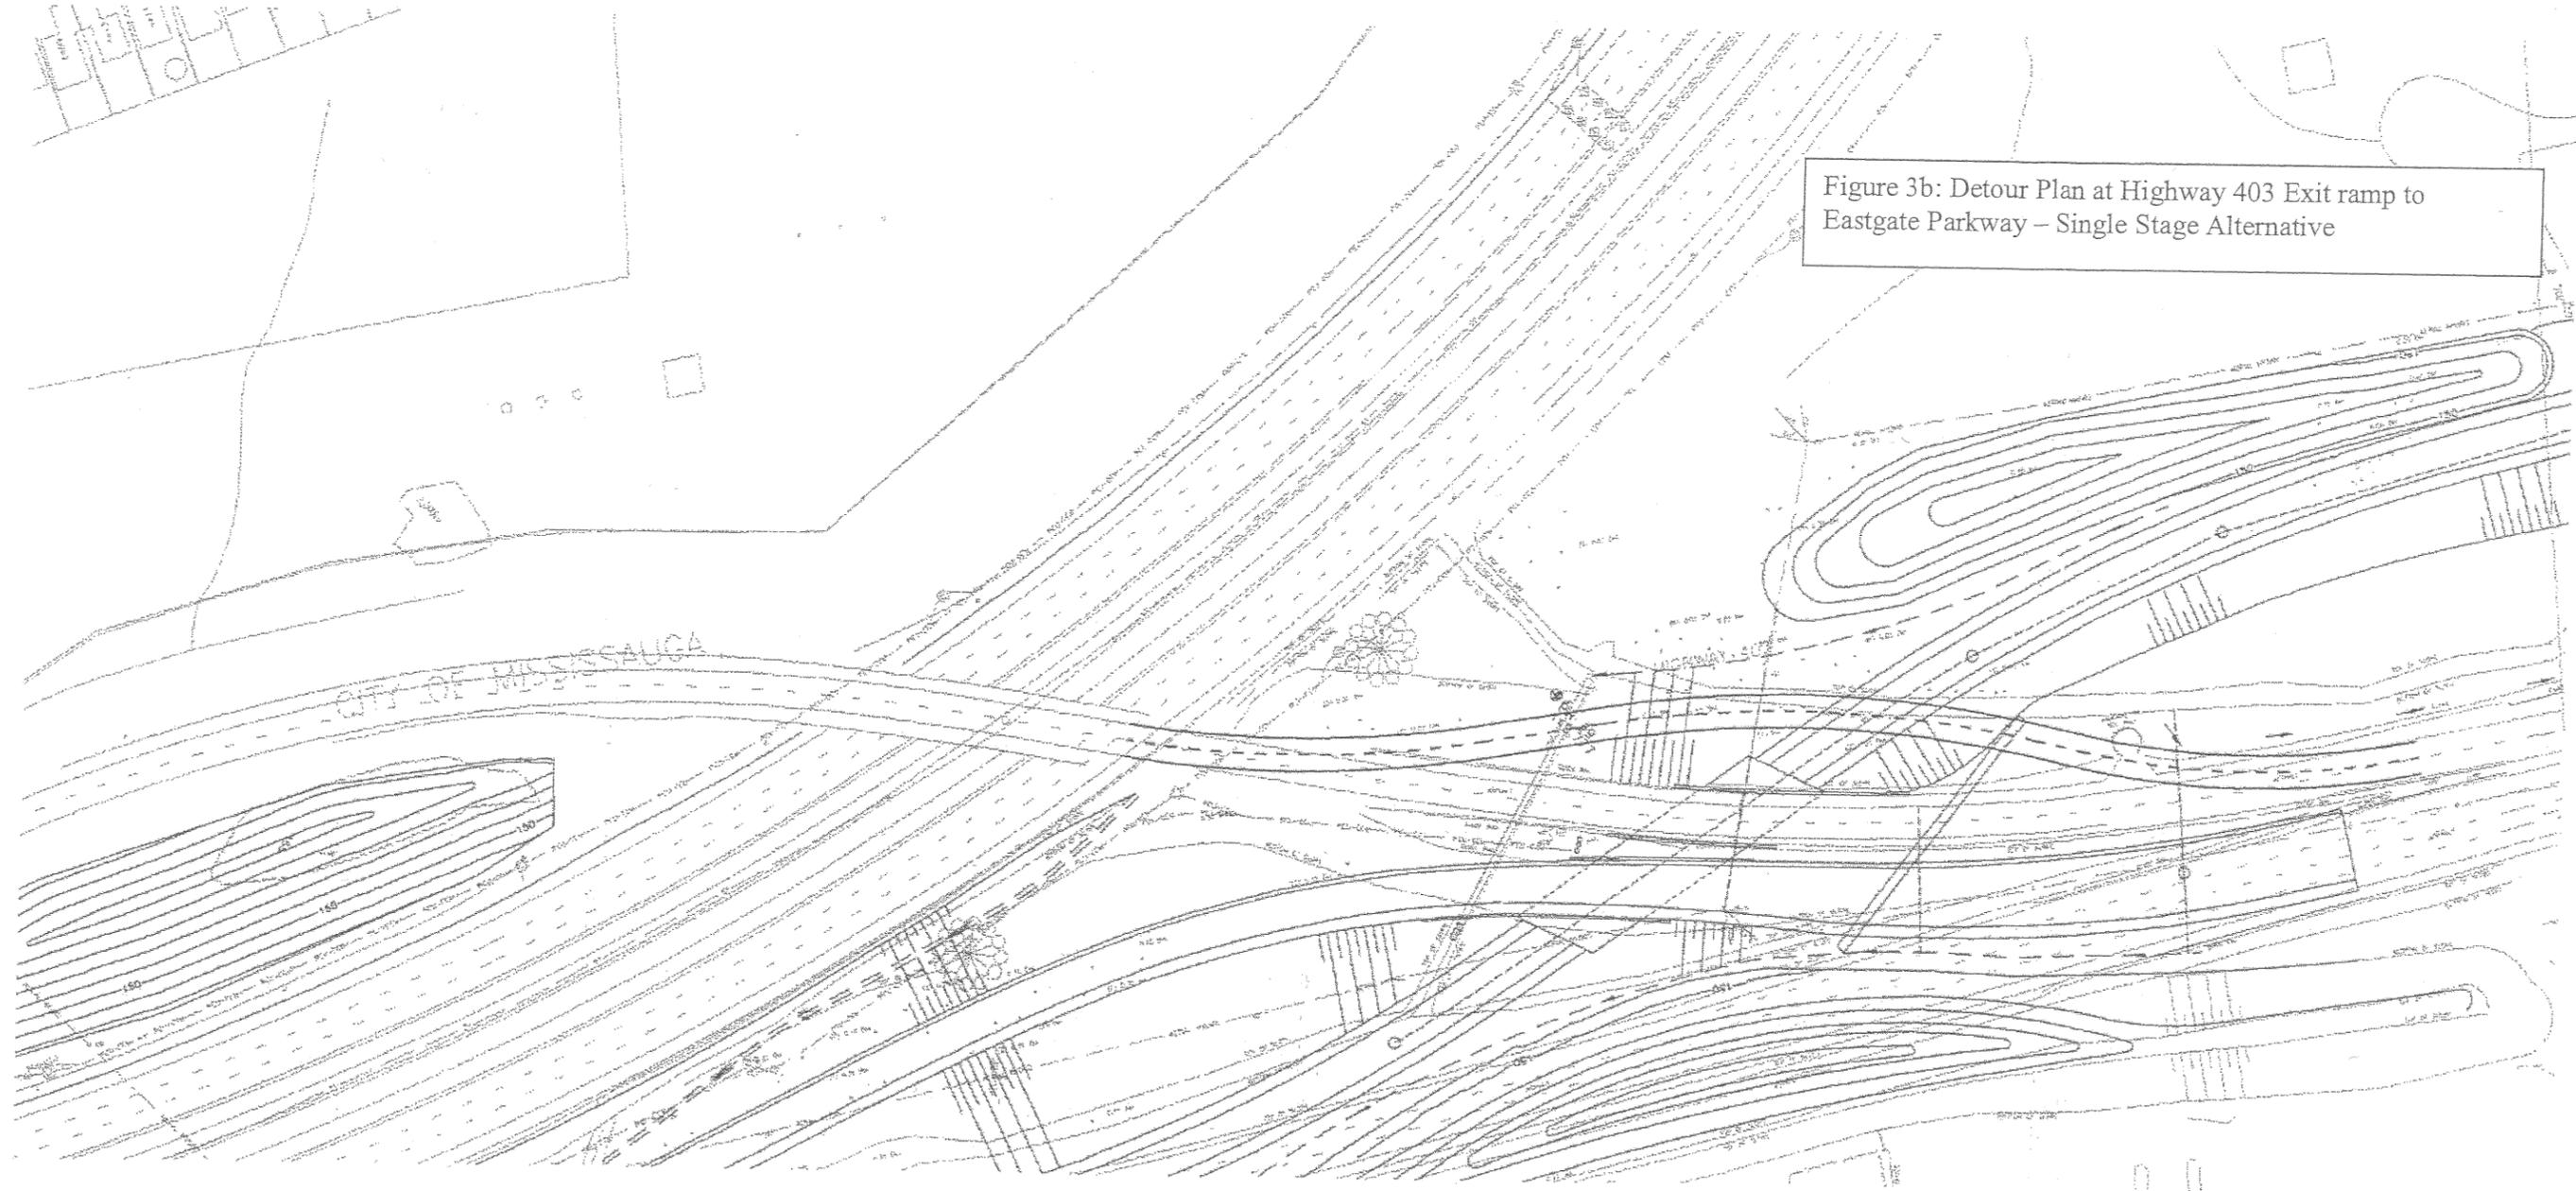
Detour Plan at Highway 403 Exit ramp to Eastgate Parkway – Single Stage Alternative
